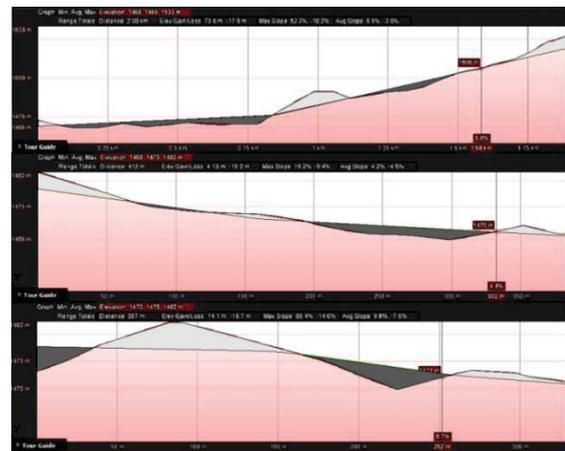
Three Road Segments Elevation Profiles and Vertical Alignments
